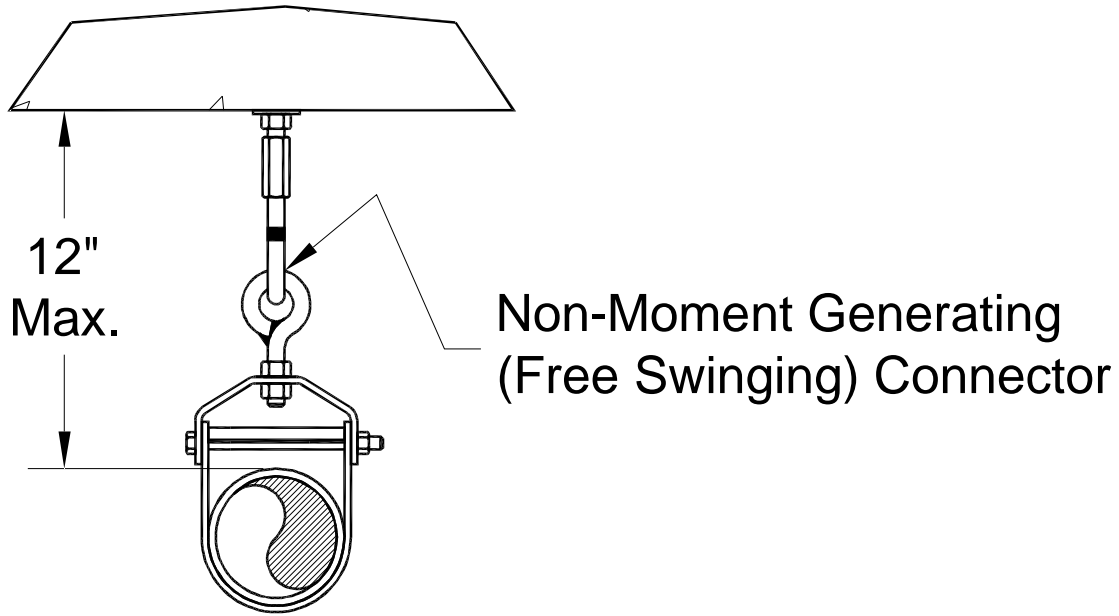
; Measurement of 12" Dimension for Single Clevis Supported Pipe
